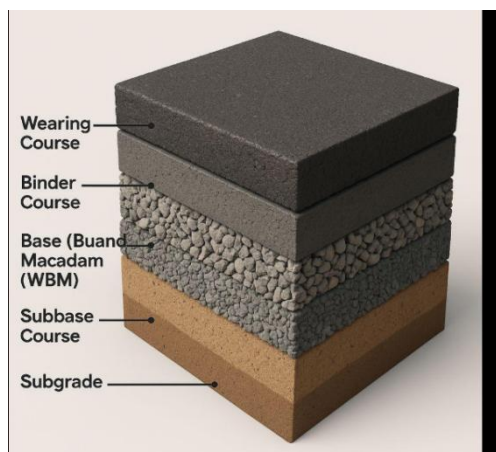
Multilayer Flexible Pavement Structure Designed Using IIT PAVE
